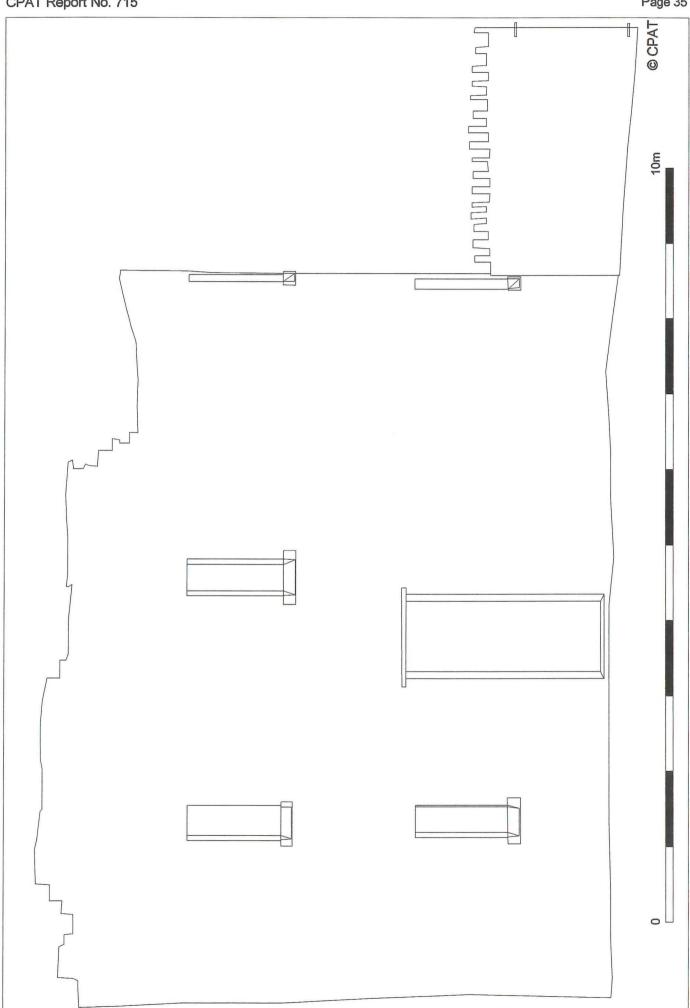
Roundhouse Farm south-west tower, north-east elevation (D-D)
